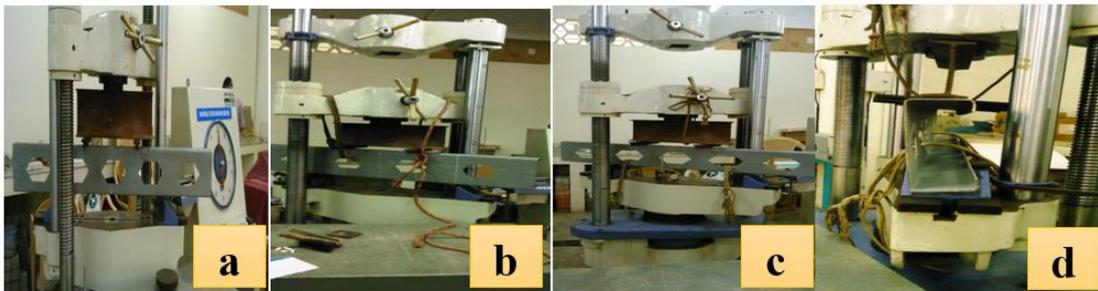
(a) Specimen setting up on instrument; (b) setting up deflection meter; (c) setting out specimen 2 – 250 mm depth; (d) local buckling case under worst loading stage
